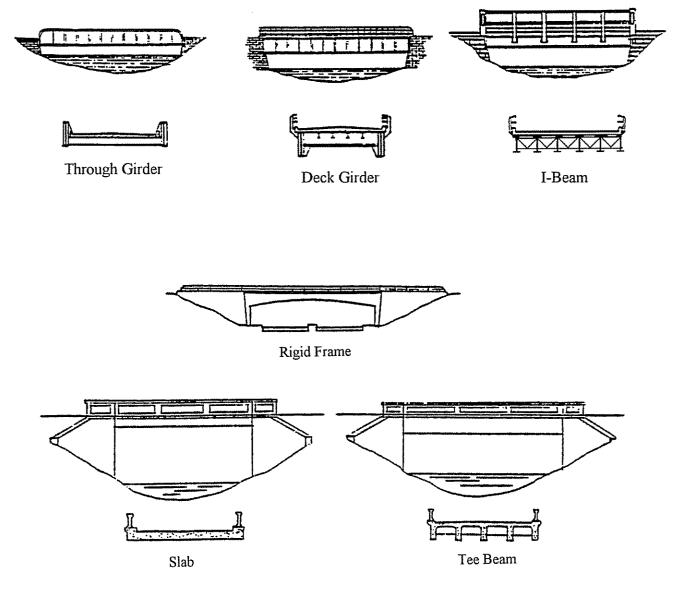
Girders and Beams (Source: NYSDOT, Bridge Inventory Manual).
